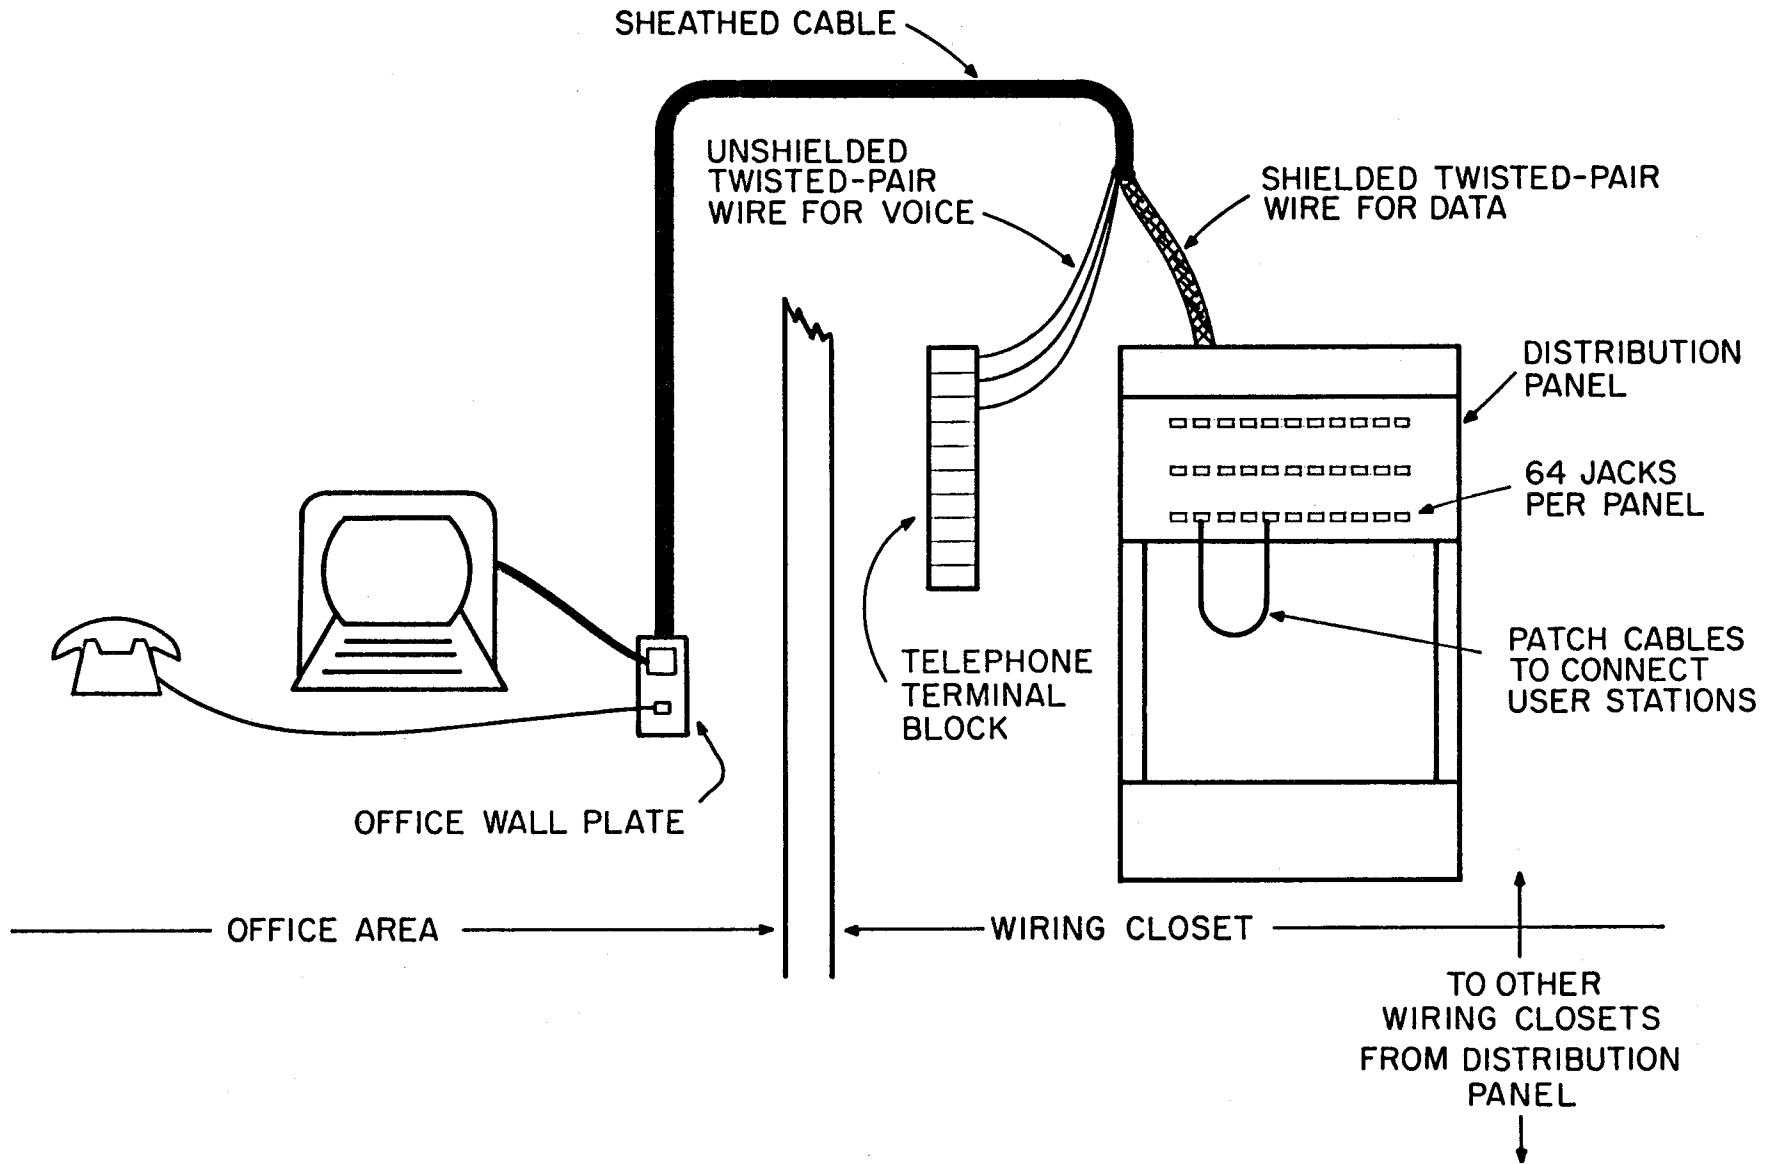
Facility cabling plan (after IBM, 1984c).
